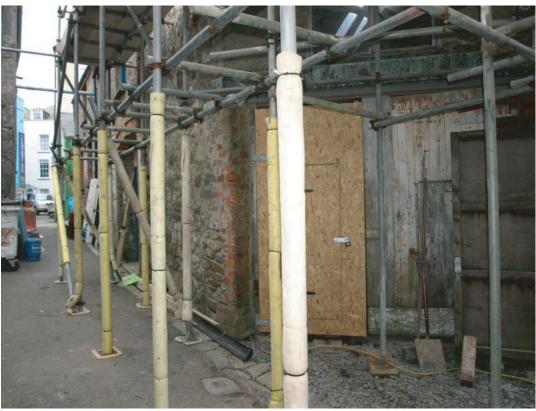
View of northeast facing external elevation (Storage Building No.1). Main entrance fronting Sergeants Lane. Looking southwest.
